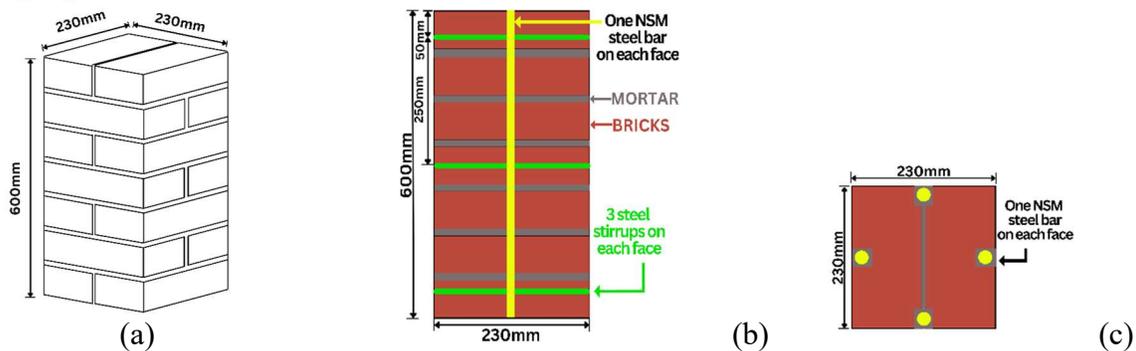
Sample Details (a) Control specimen (b) Strengthened specimen side view (c) Top view
